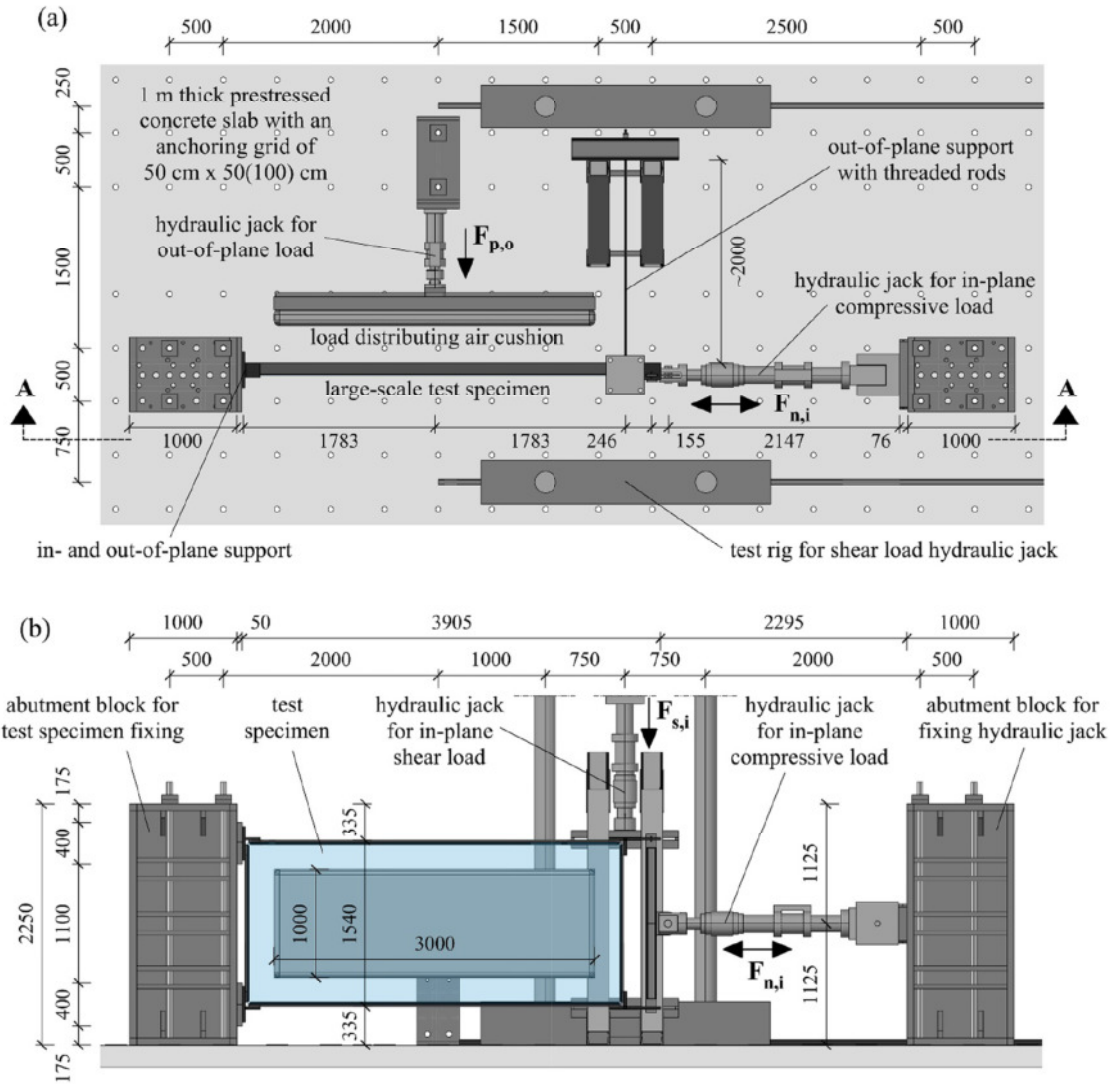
Main dimensions of the setup in [mm] for testing the large-scale specimens illustrated in a top view (a) and a front view (b).
